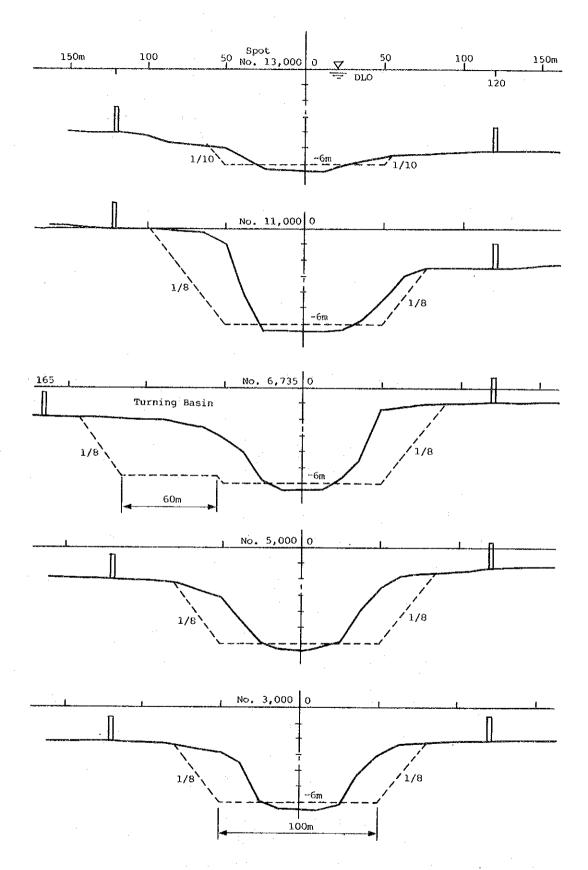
Profiles of Channel and Location of Submerged Walls
